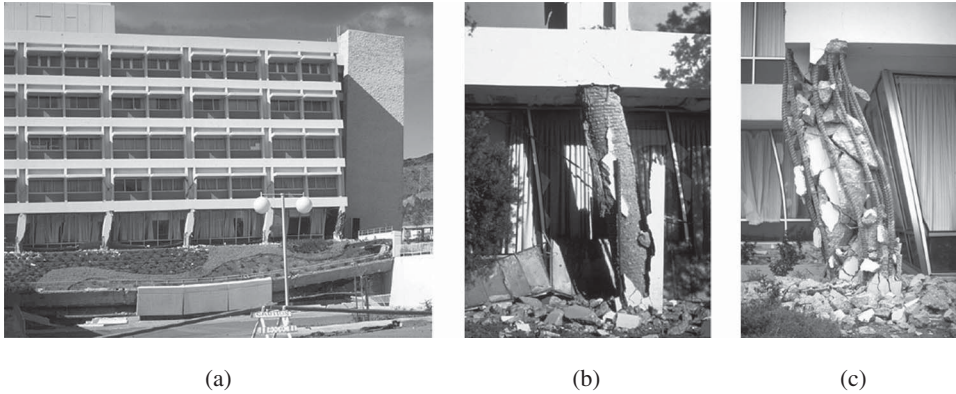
Damage to Olive View Hospital (a) A wing of the building showing approximately 600 mm drift in its first storey (b) Damaged spirally reinforced column in first storey still carrying load (c) Completely collapsed tied rectangular corner column in the same storey
